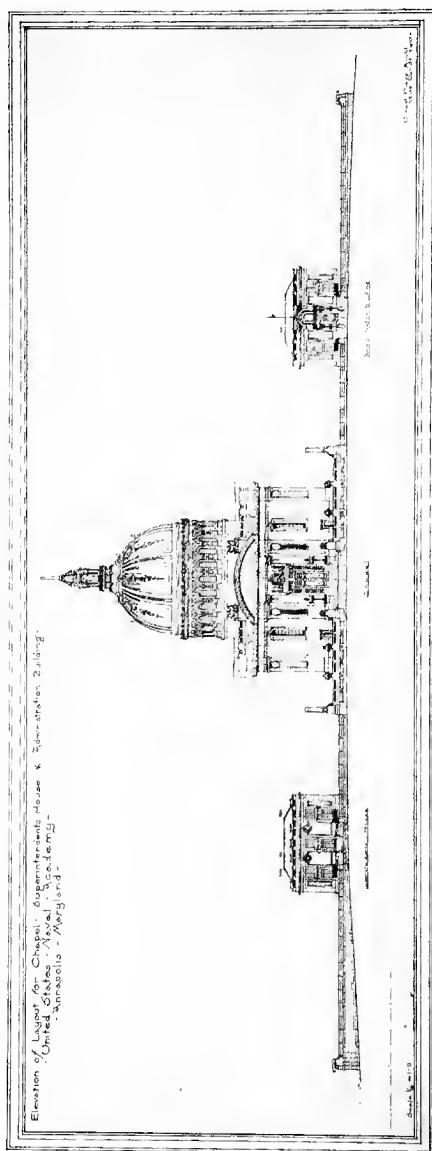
ELEVATION SHOWING CHAPEL, SUPERINTENDENT'S HOUSE AND ADMINISTRATION BUILDING.
